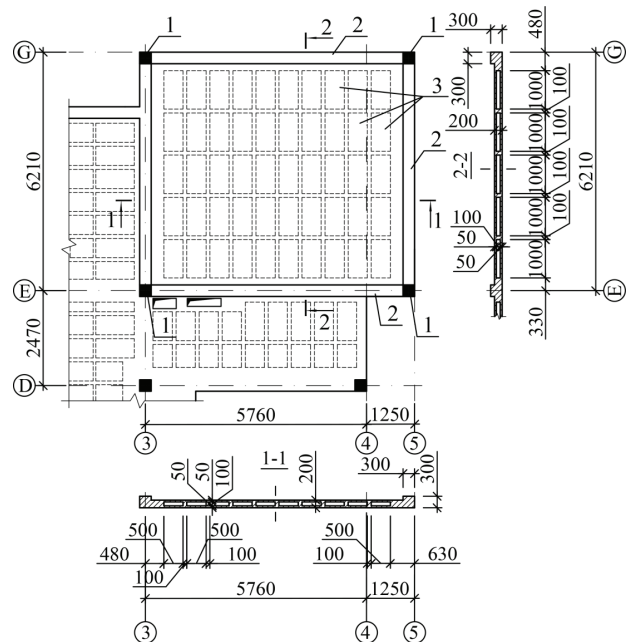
Fragment of a monolithic reinforced concrete flooring slab with prismatic inserts: 1 – columns; 2 – contour beams; 3 – inserts
